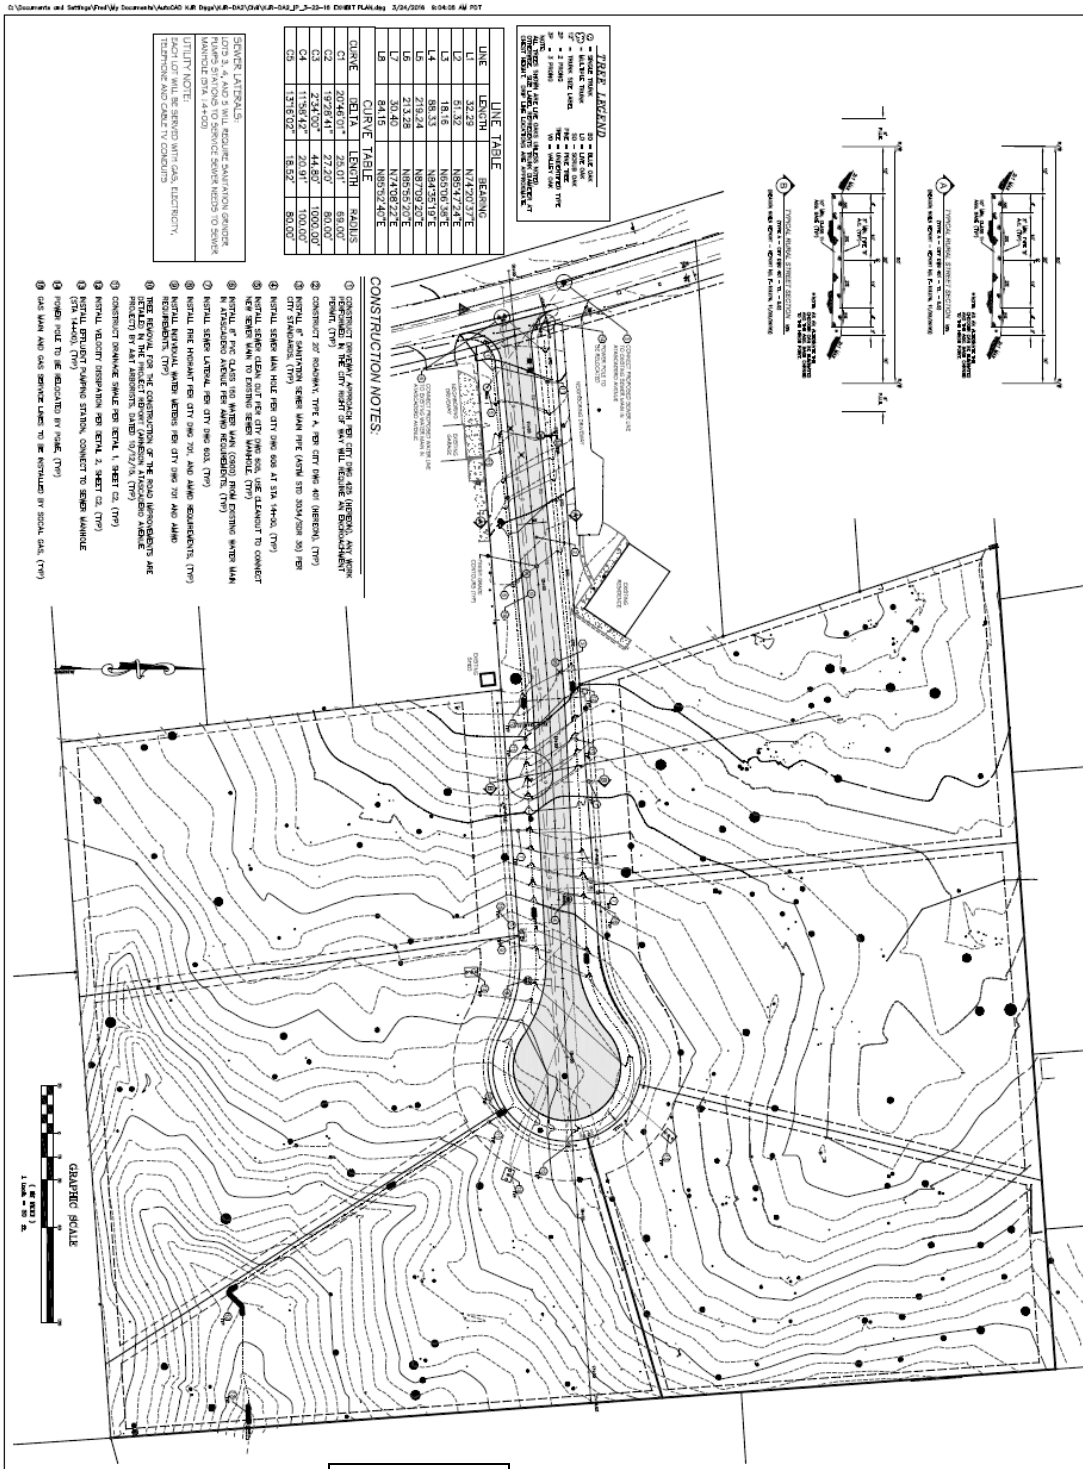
EXHIBIT C: Preliminary Grading Plan -Tract 3147
